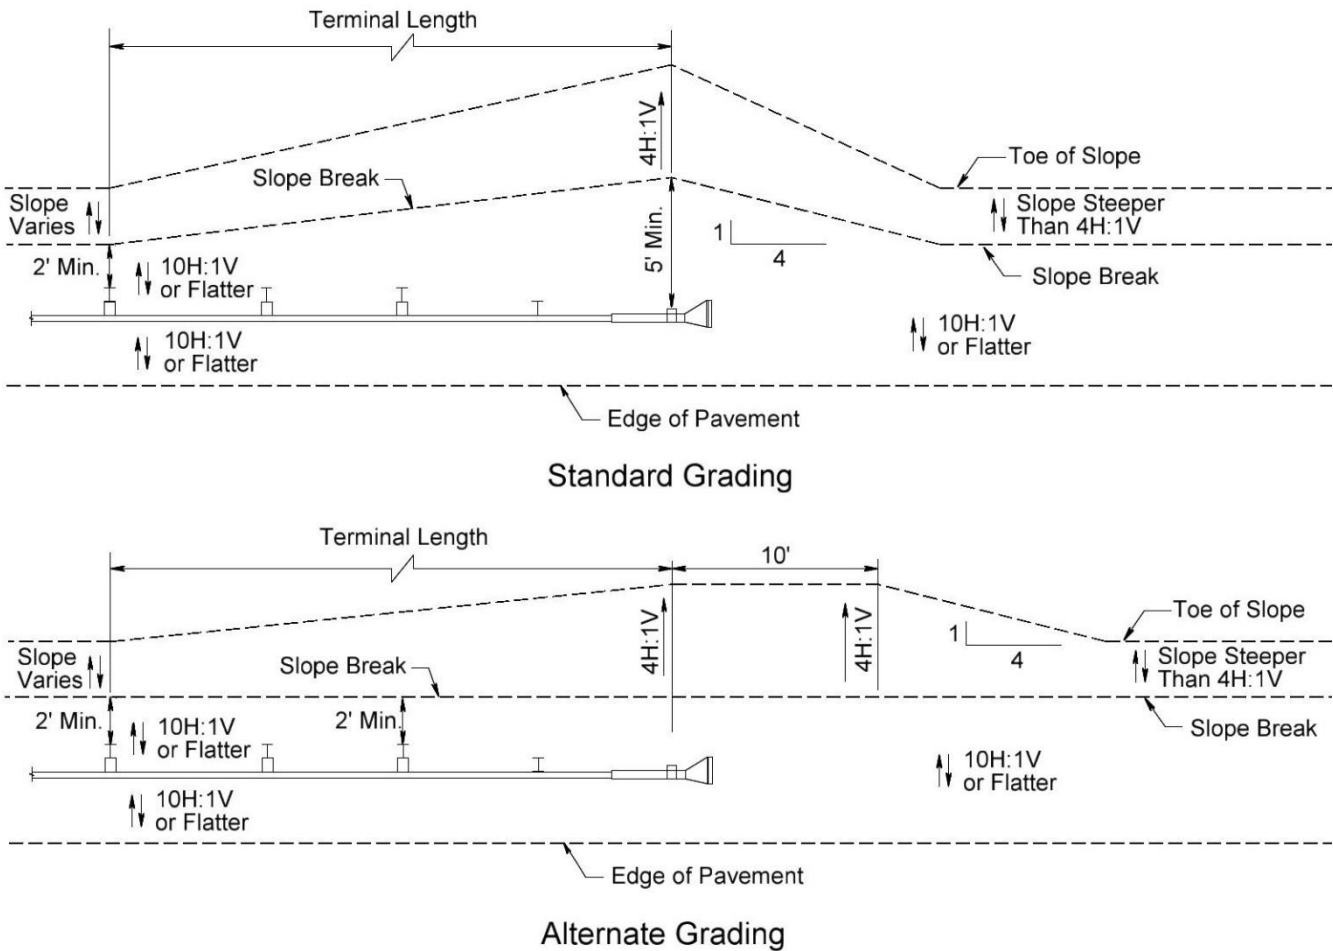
Grading Treatment at W-beam and Box Beam Tangent Terminals
